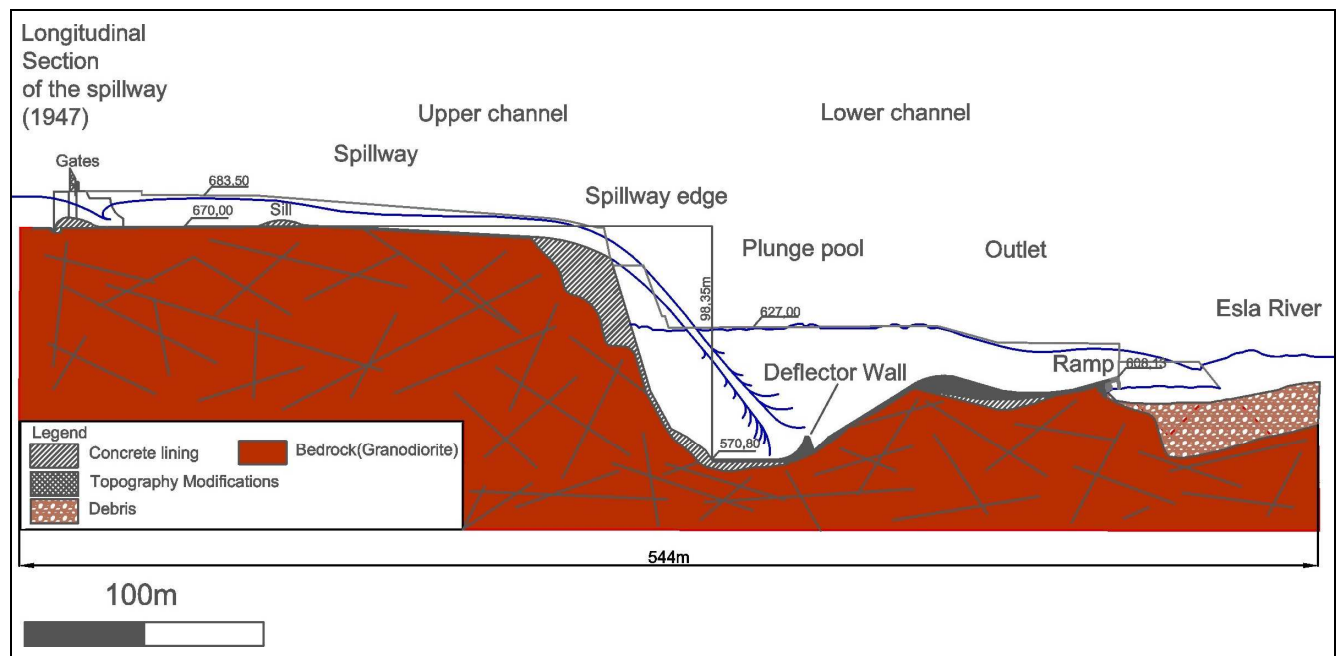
18: Layout of the spillway after the reform as it was in 1947. The energy dissipating system with concrete teeth at the spillway edge was constructed in 1964 (redrawn and modified after Iberduero, 1947).
